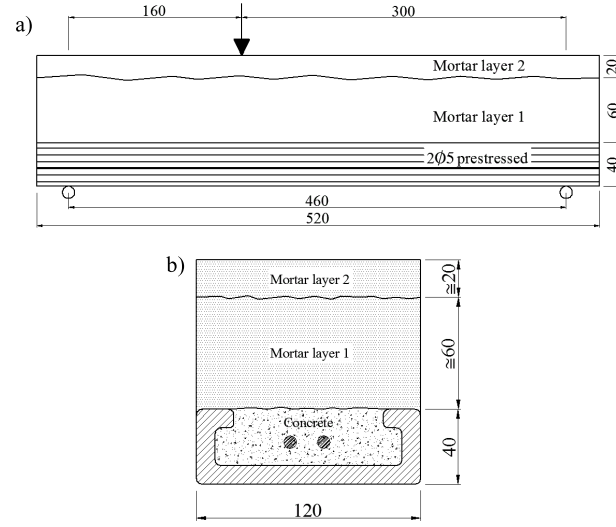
Sketch of the specimens under testing. Longitudinal view a) and cross section b).
